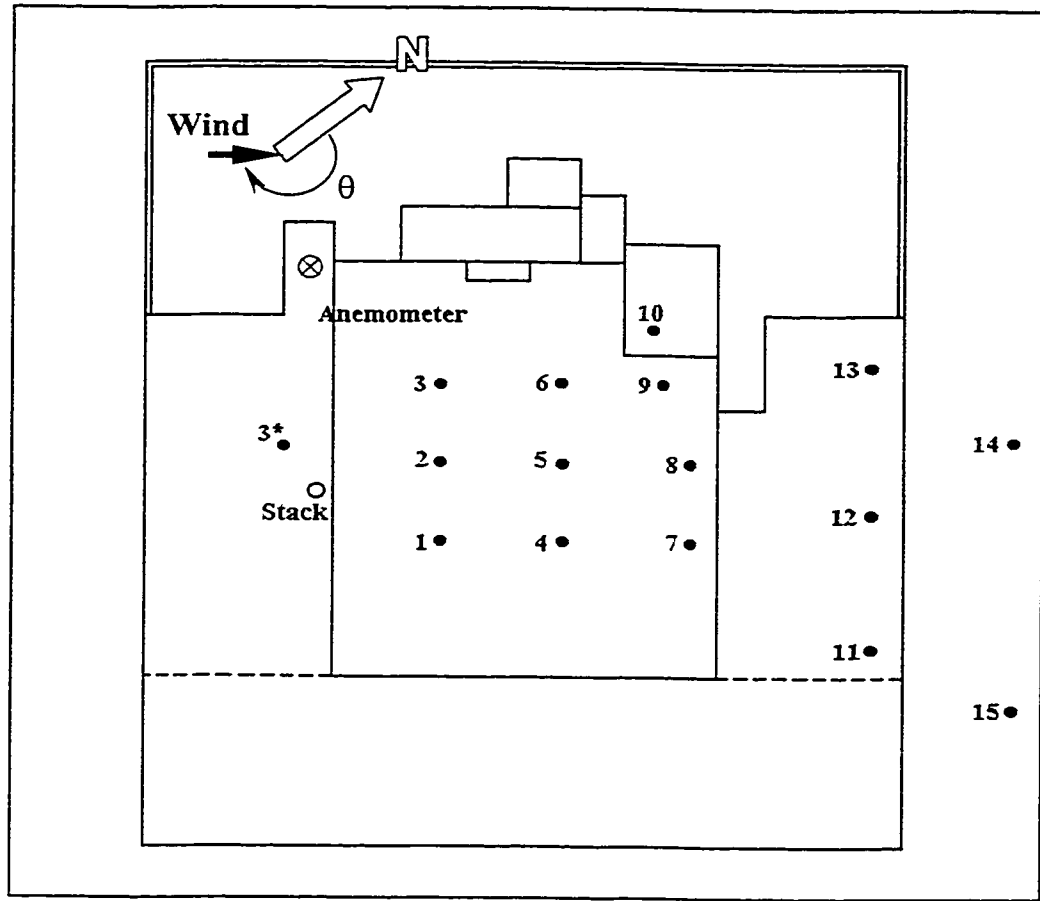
Plan and section drawings of Hall Building roof showing locations of the stack, sampler and the anemometer
